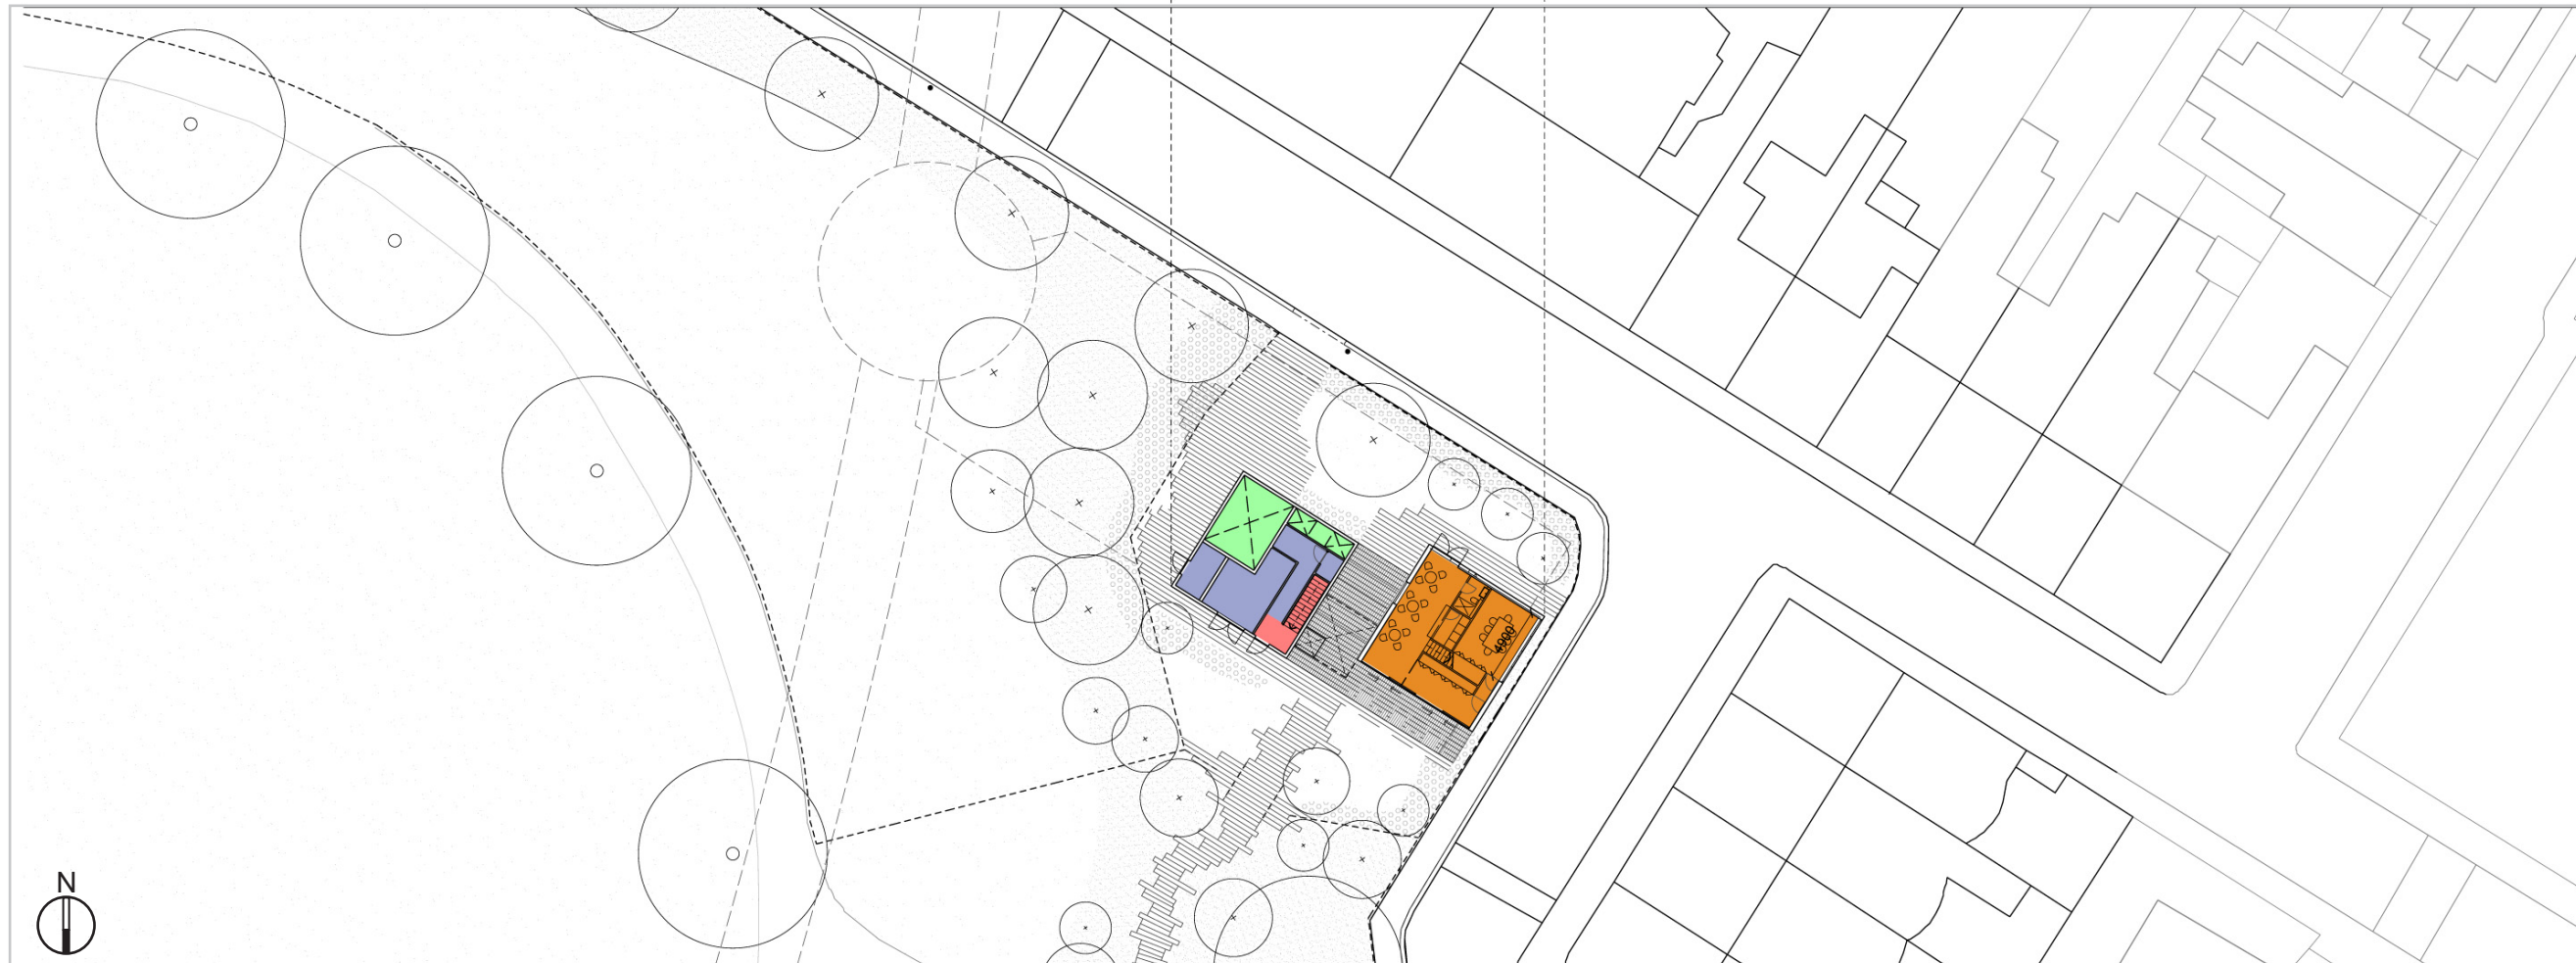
Kennington Park - Proposed Layout of the Head House and Community Building
